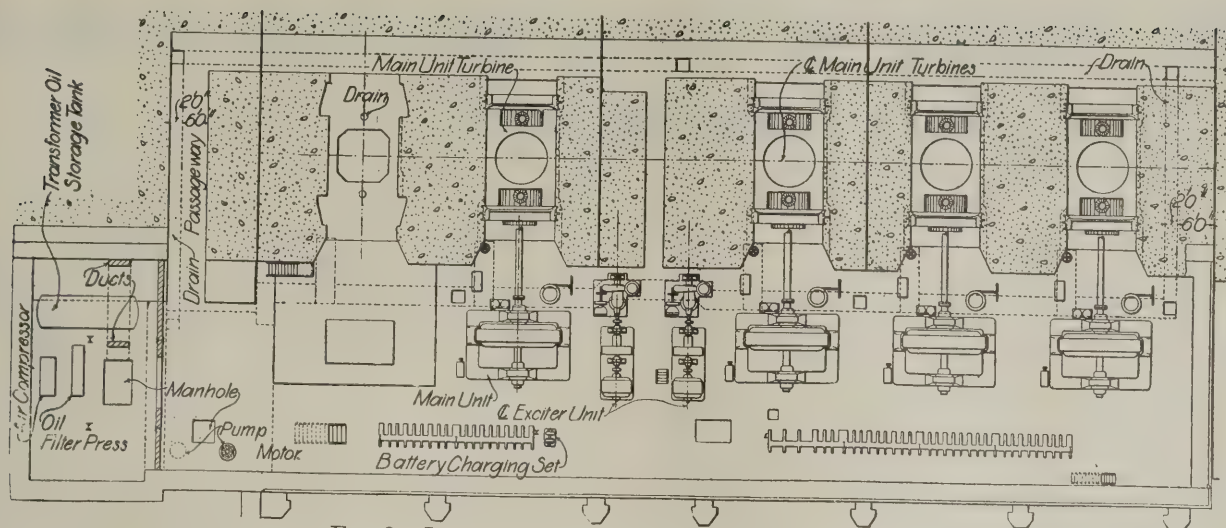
LAYOUT OF EQUIPMENT IN PARKSVILLE STATION.
